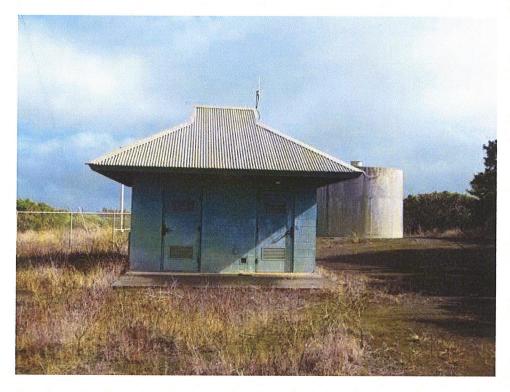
Hamakuapoko Well No. 1 Electrical Building (East View)
